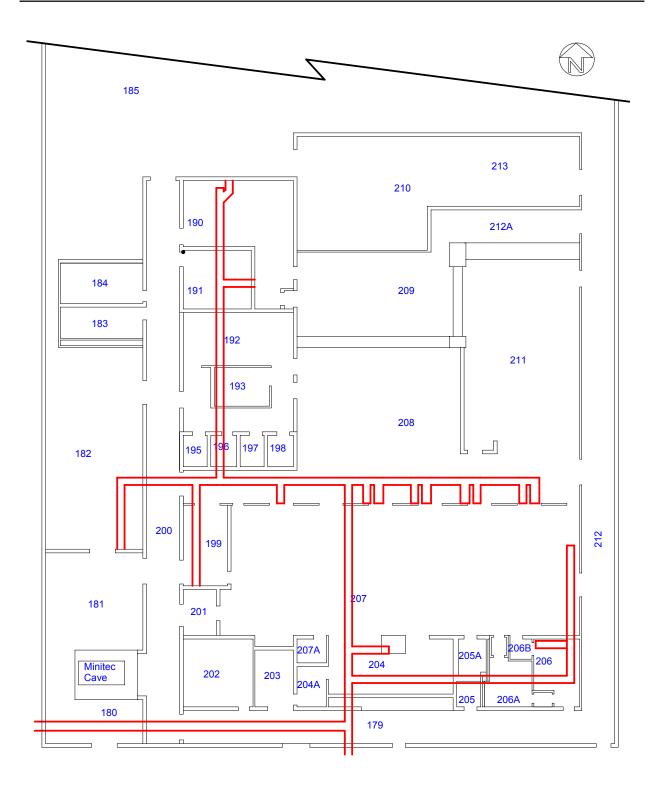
BMS B-124 New Section Class 2 Area Pipe Trenches
